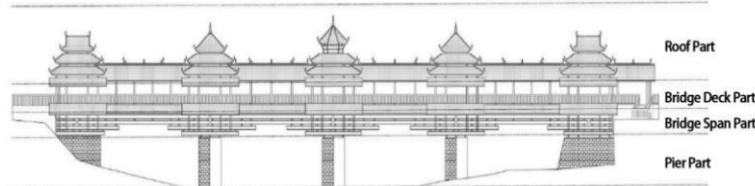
Structural diagram of Yongji Bridge. It consists of four parts: roof part, bridge deck part, bridge span part, and bridge pier part. Source: Drawn by Hong Zizhen, annotated by Chen Lu. April 10, 2024
